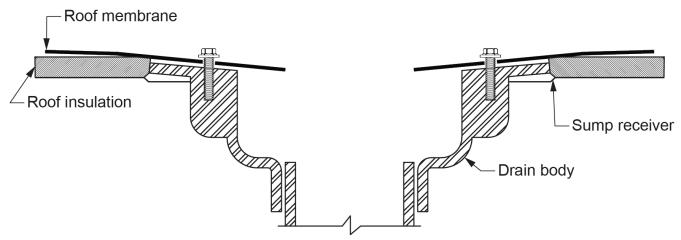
Installation of a roof drain body. (Skilled Trades BC, 2021) Used with permission.
